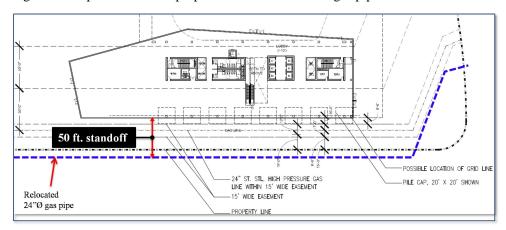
Proposed building foundation plan and proposed location of natural gas pipeline (Enlarged from Figure 1)
